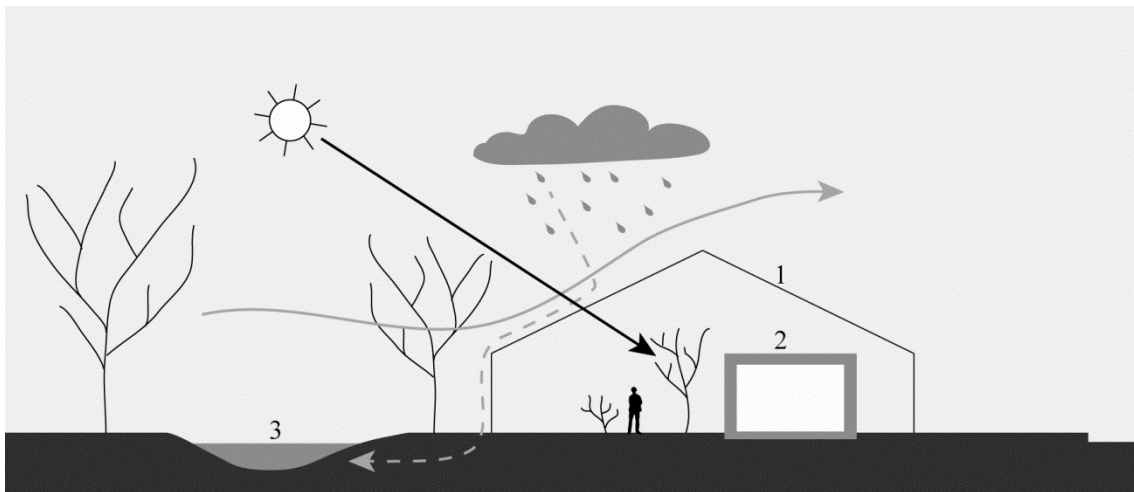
Concept of Torkild Kristensen's house. 1: Standard industrial greenhouse. 2: Dwelling with light-weight plaster facades. 3: Pond for collecting rain water.
